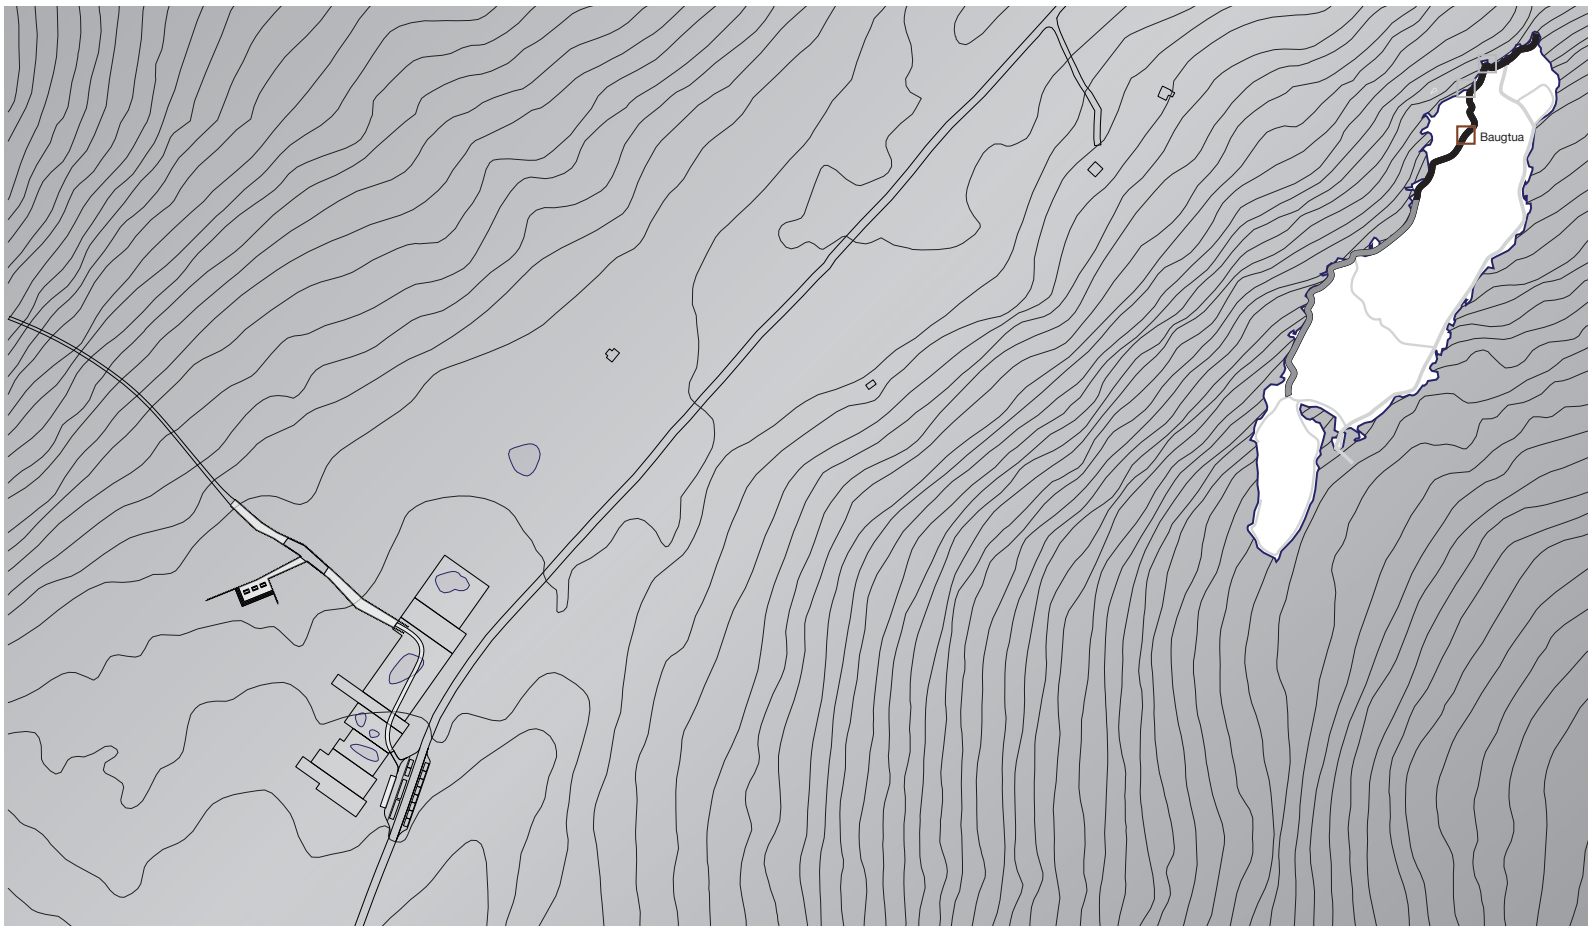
Bagtua – Site plan. Inset: Andøya NTR map and site location.
